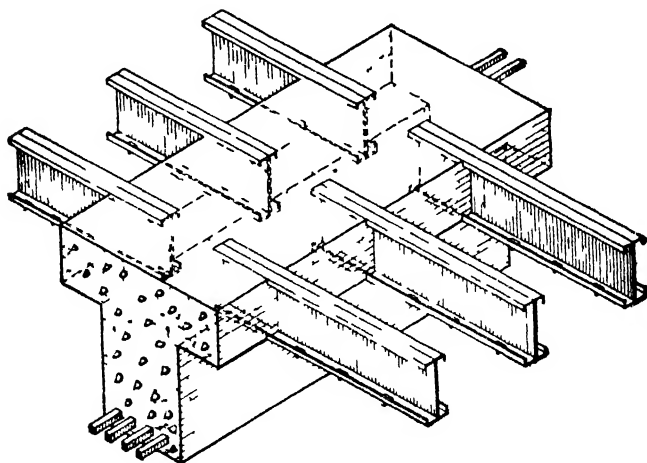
Berloy metal lumber. Detail of floor construction. When joists extend into the stem of the concrete girder the stem should be wide enough to allow two inch bearings with space between end of joists for bent up bars if used.
